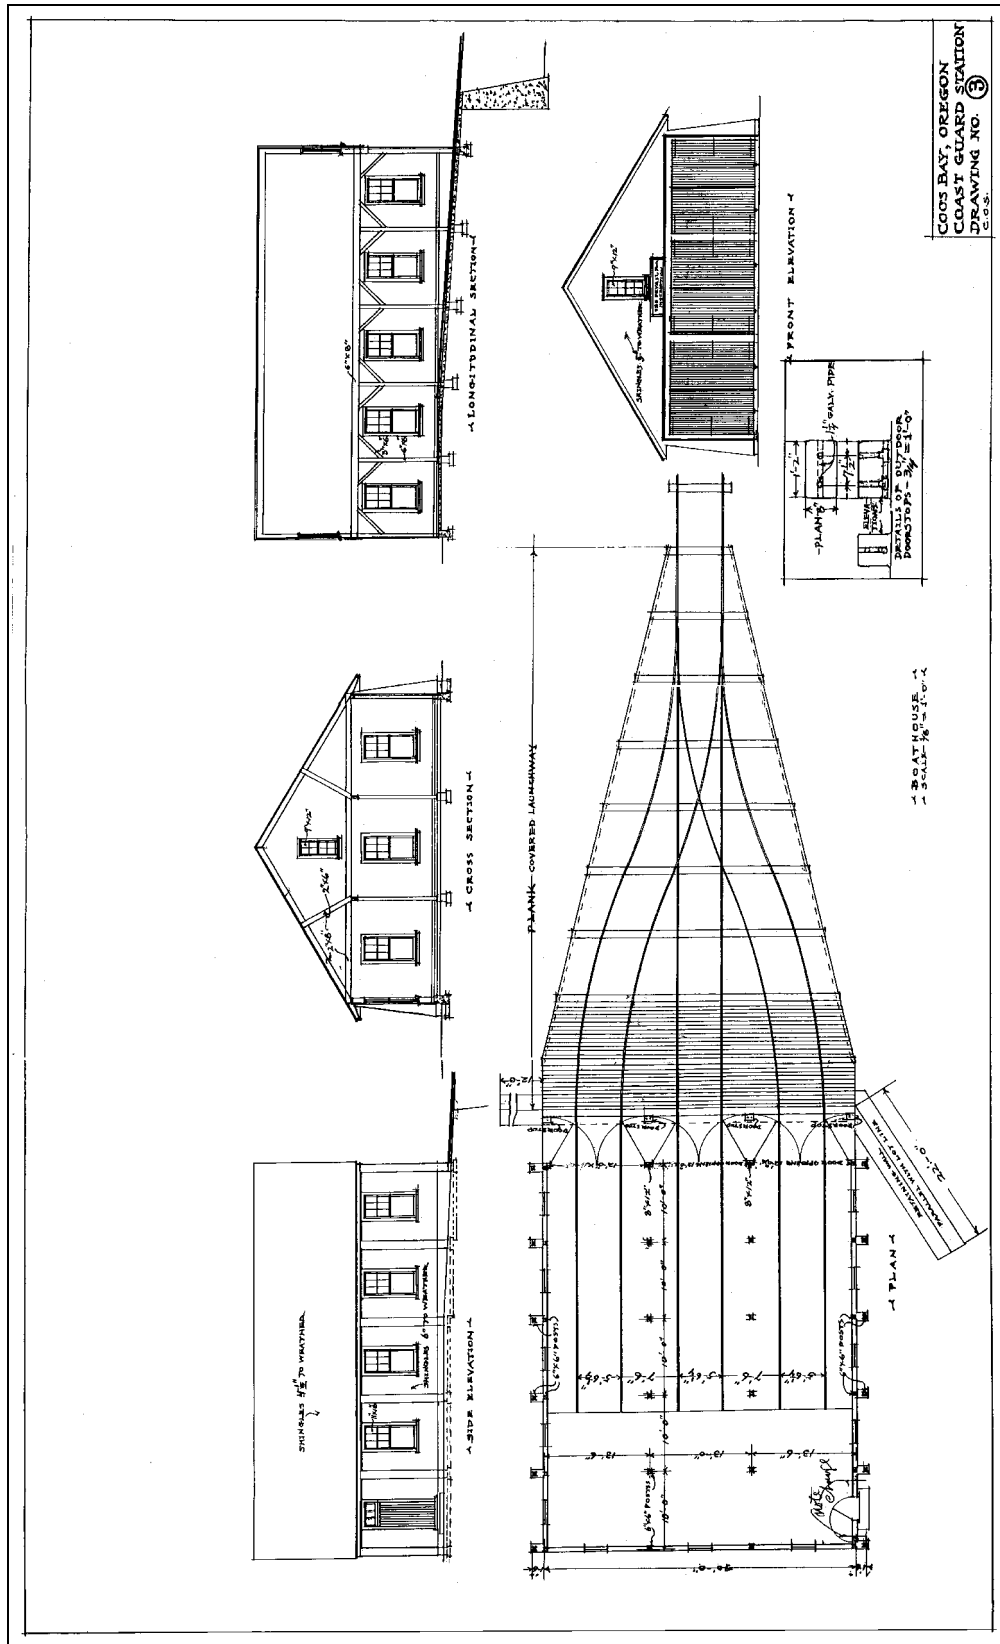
Coos Bay Lifeboat Station, Boathouse Plan, 1915. Source: Oregon Institute of Marine Biology.
